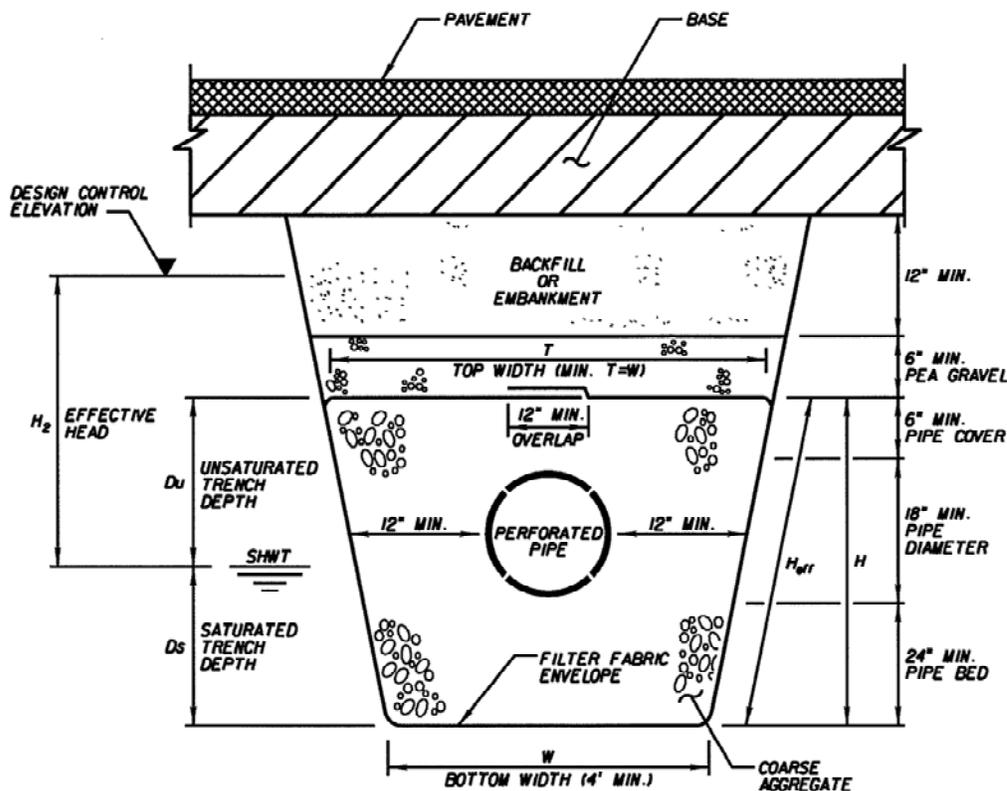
TYPICAL EXFILTRATION TRENCH
